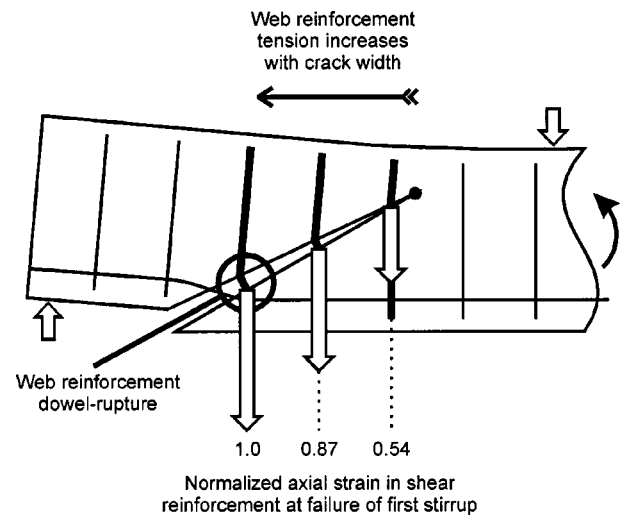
Variation in shear reinforcement strain and concrete-reinforcement slip along shear crack, just before failure of first stirrup
